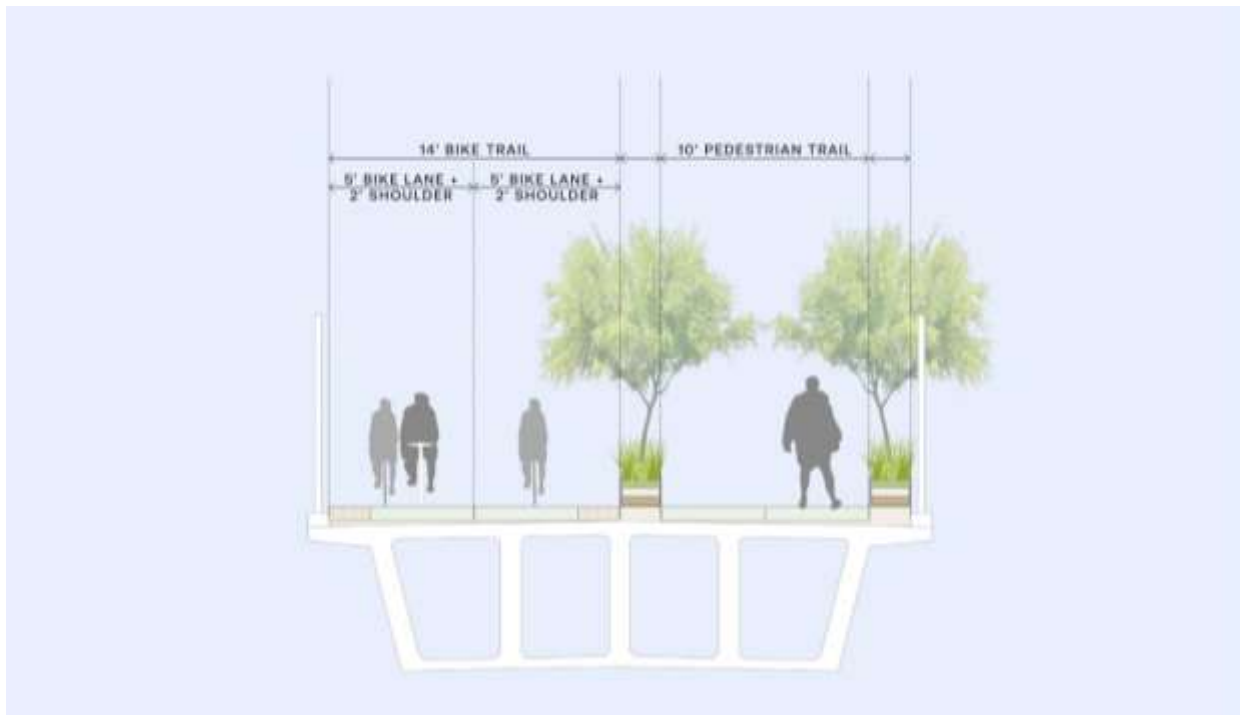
Section of the west tie-in structure, CIP PT box girder alternative.
